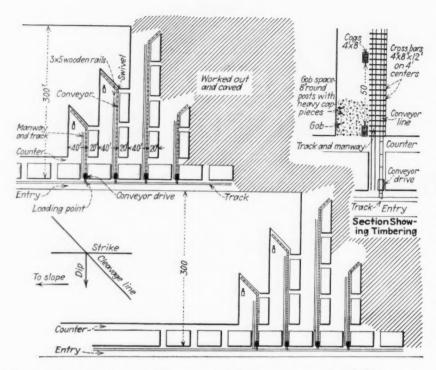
Mining with shortwall cutters and jigging conveyors in pitching seams
